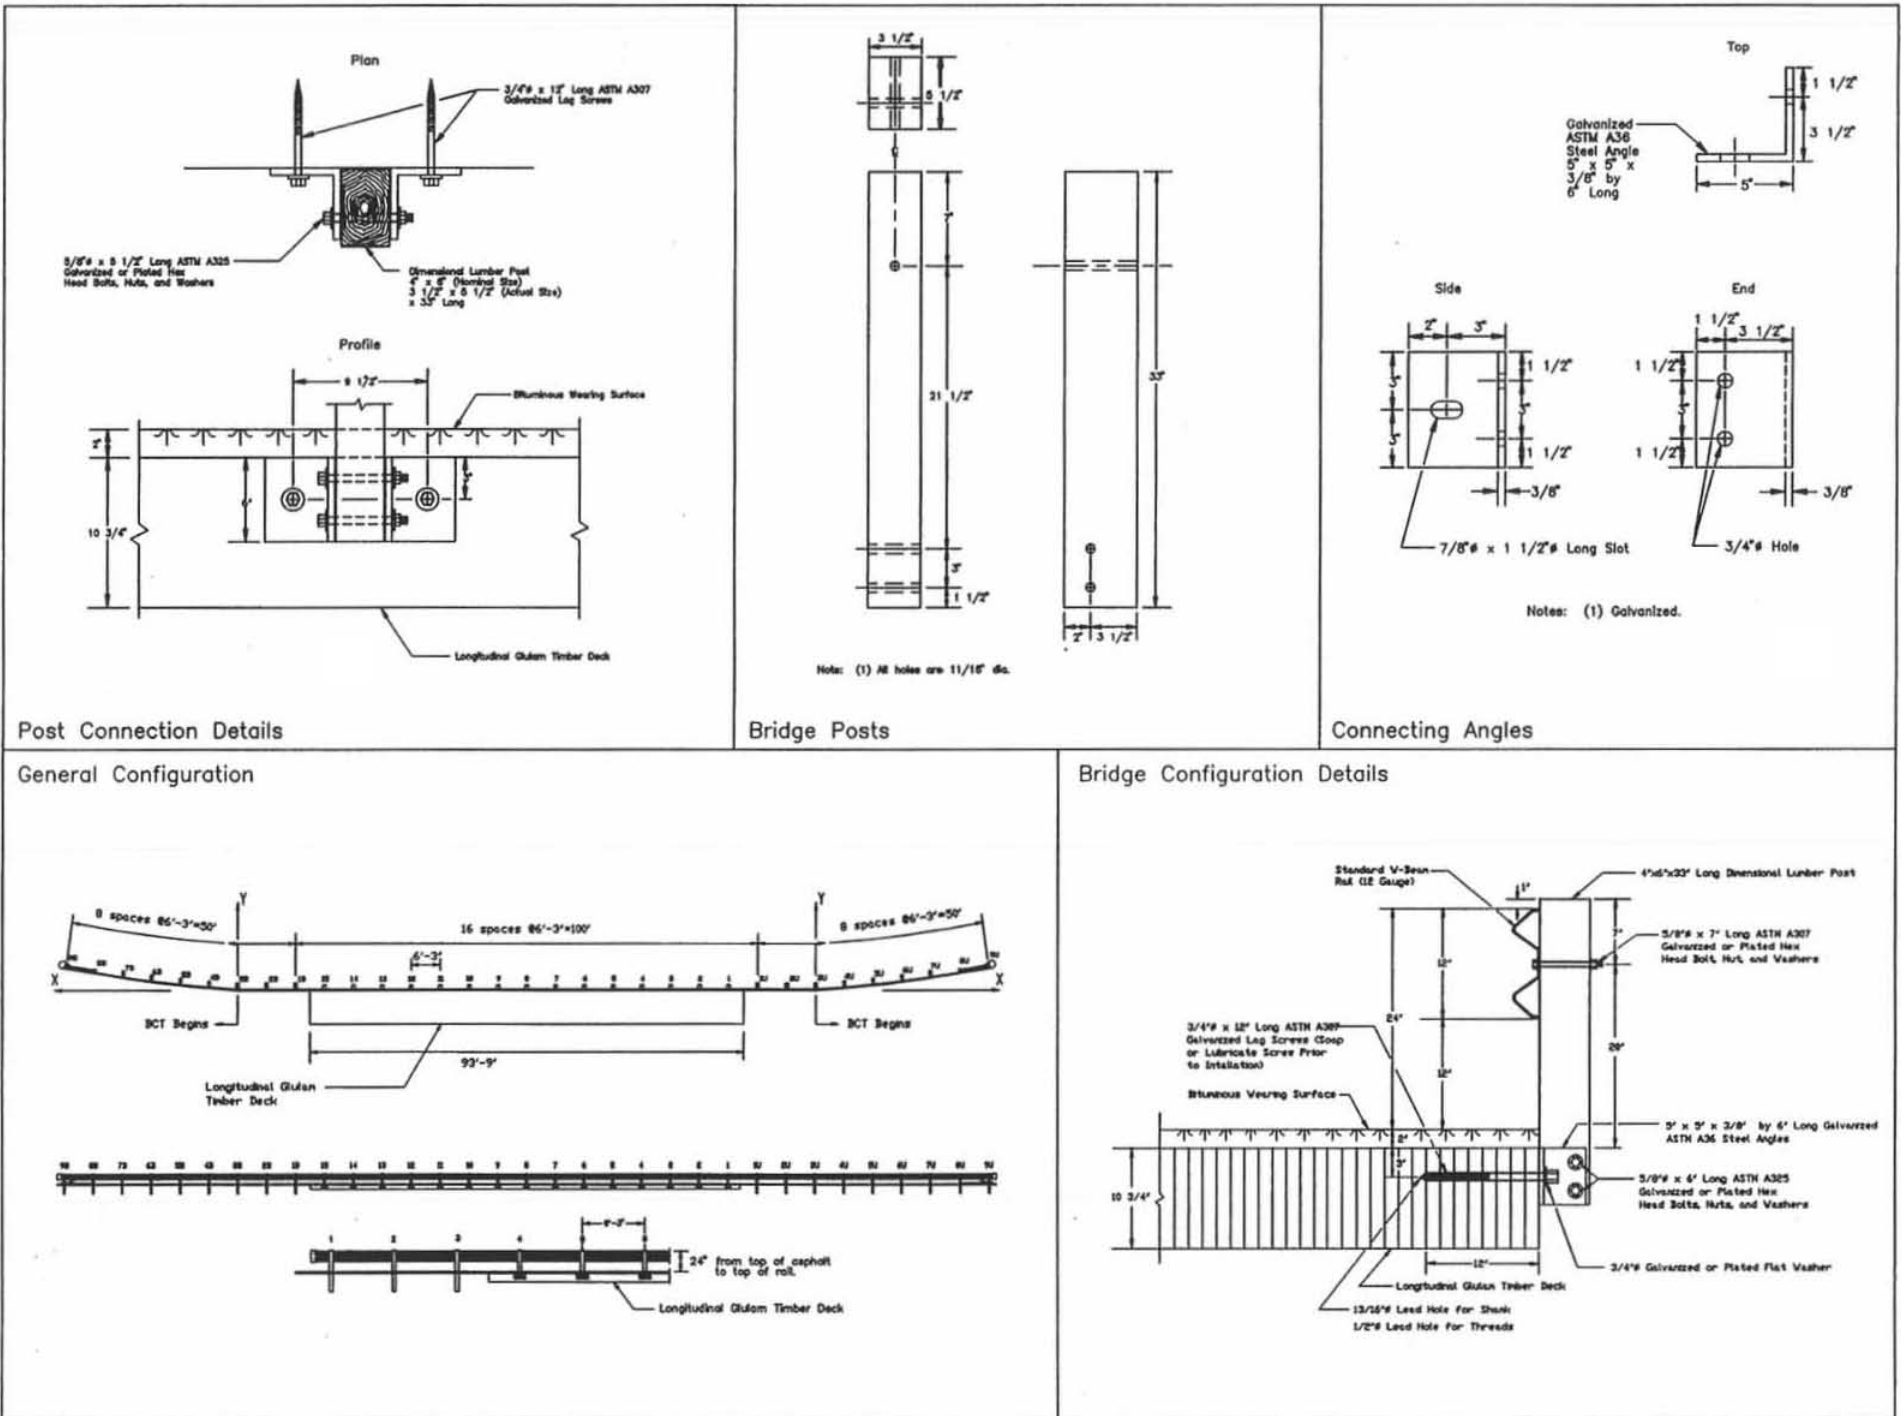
Flexible W-Beam Bridge Railing System Design Details, Design No. 1
